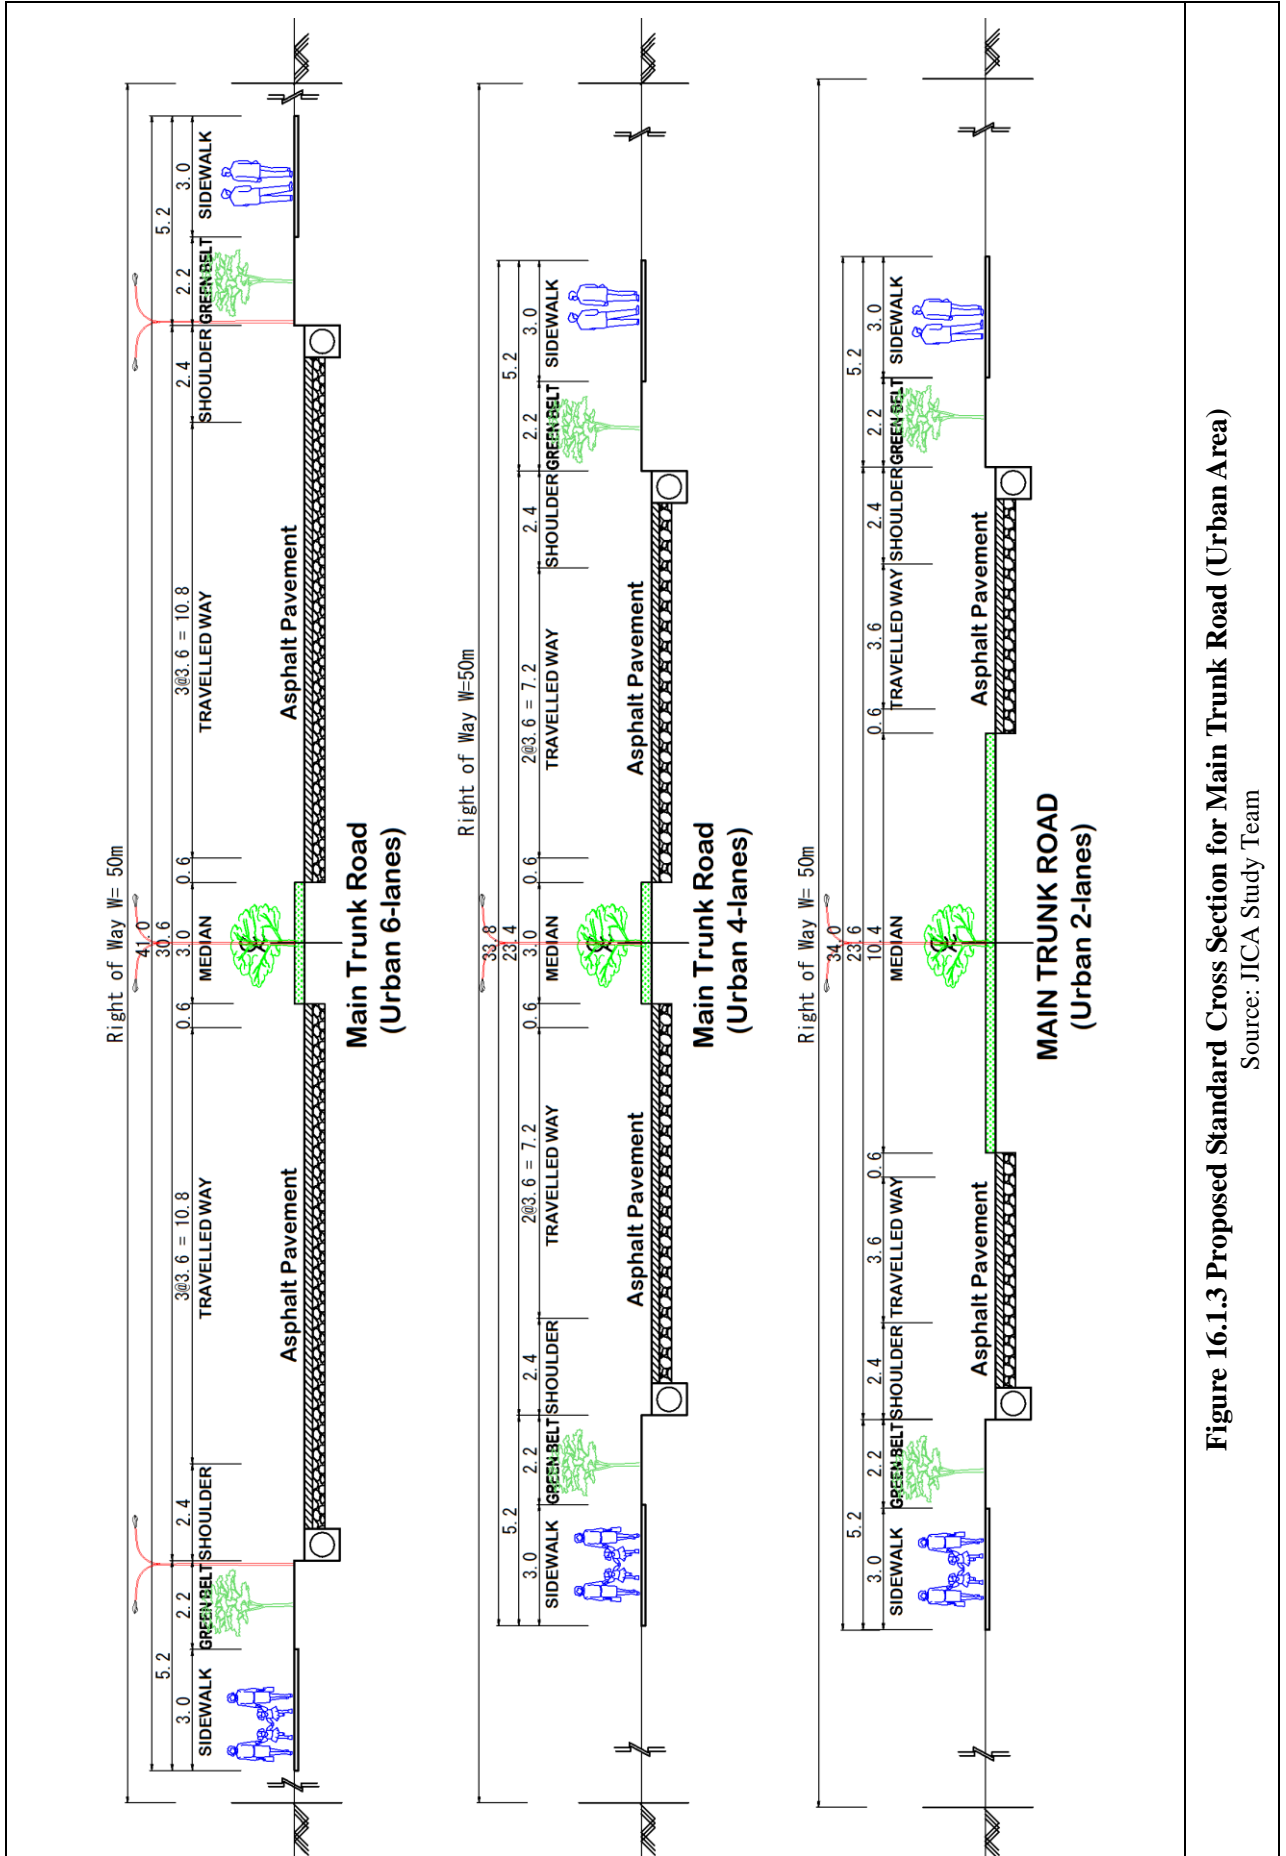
Proposed Standard Cross Section for Main Trunk Road (Urban Area)
